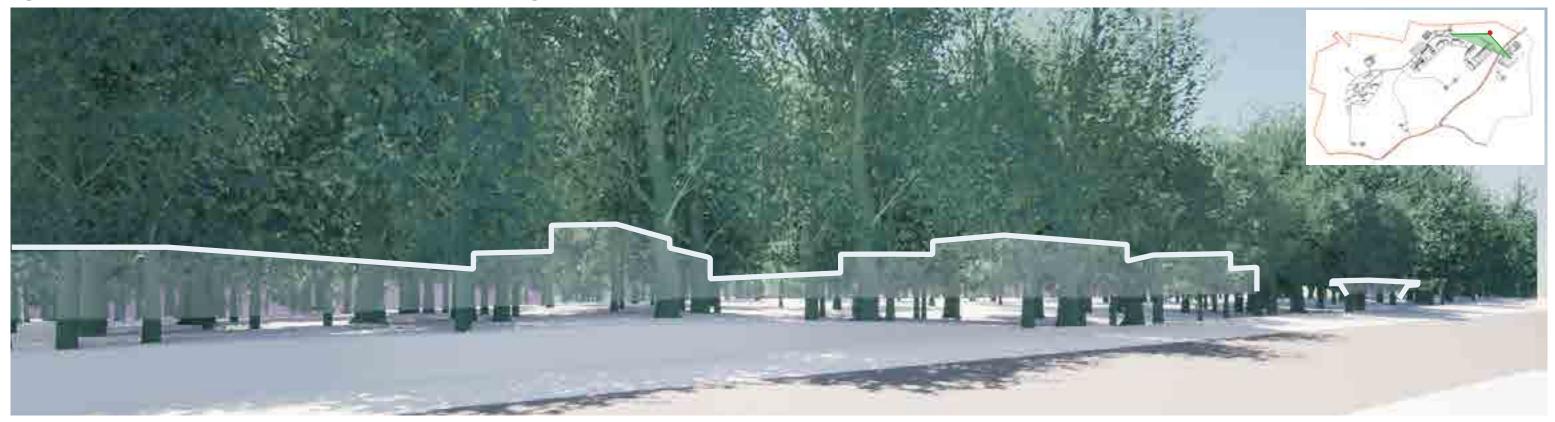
Preferred Alternative B3 view from Muirkirk Road looking West
